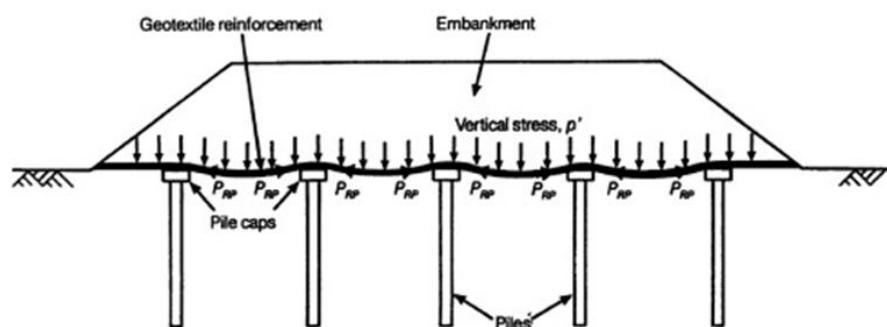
The Role of Geosynthetic Reinforcement in Transferring the Vertical Embankment Loading onto The Pile Caps
